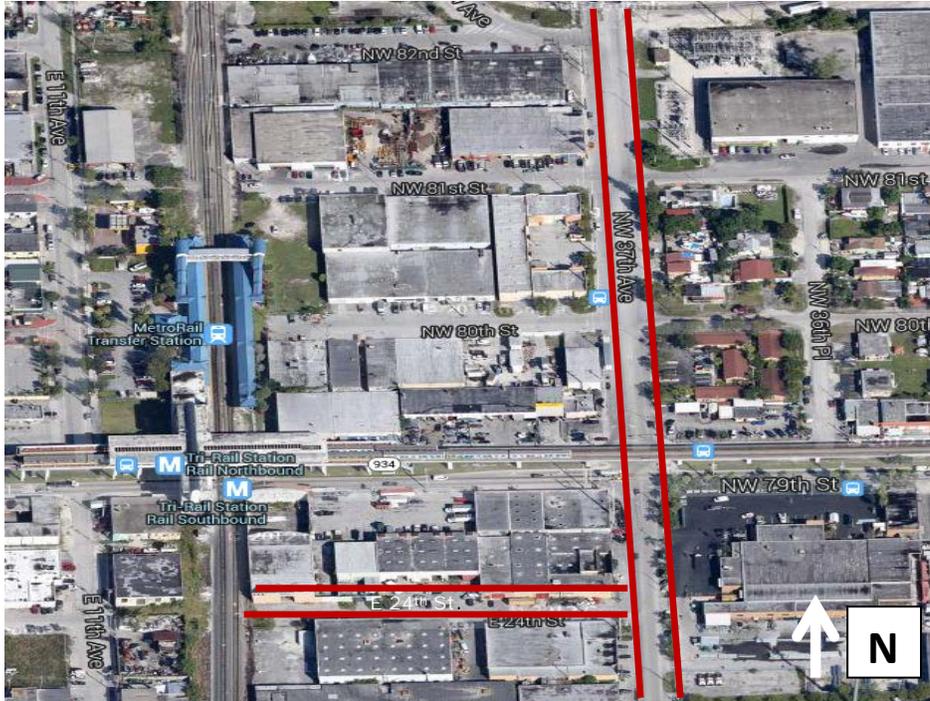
NW 37th Ave Sidewalks (MET1) - Construct sidewalks on both sides of NW 37th Ave. and on E 24th St between NW 37th Ave and rail ROW
